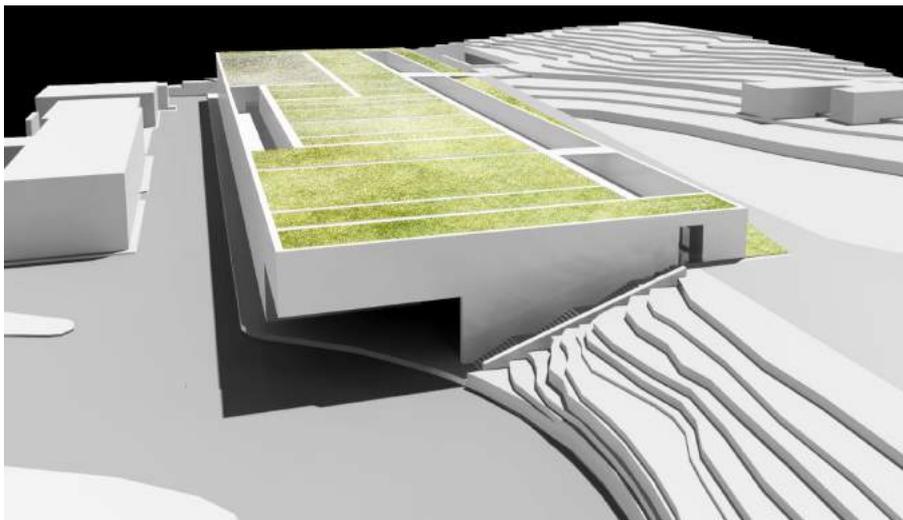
A 3D view (West side) of the EuPRAXIA@SPARC_LAB building.
